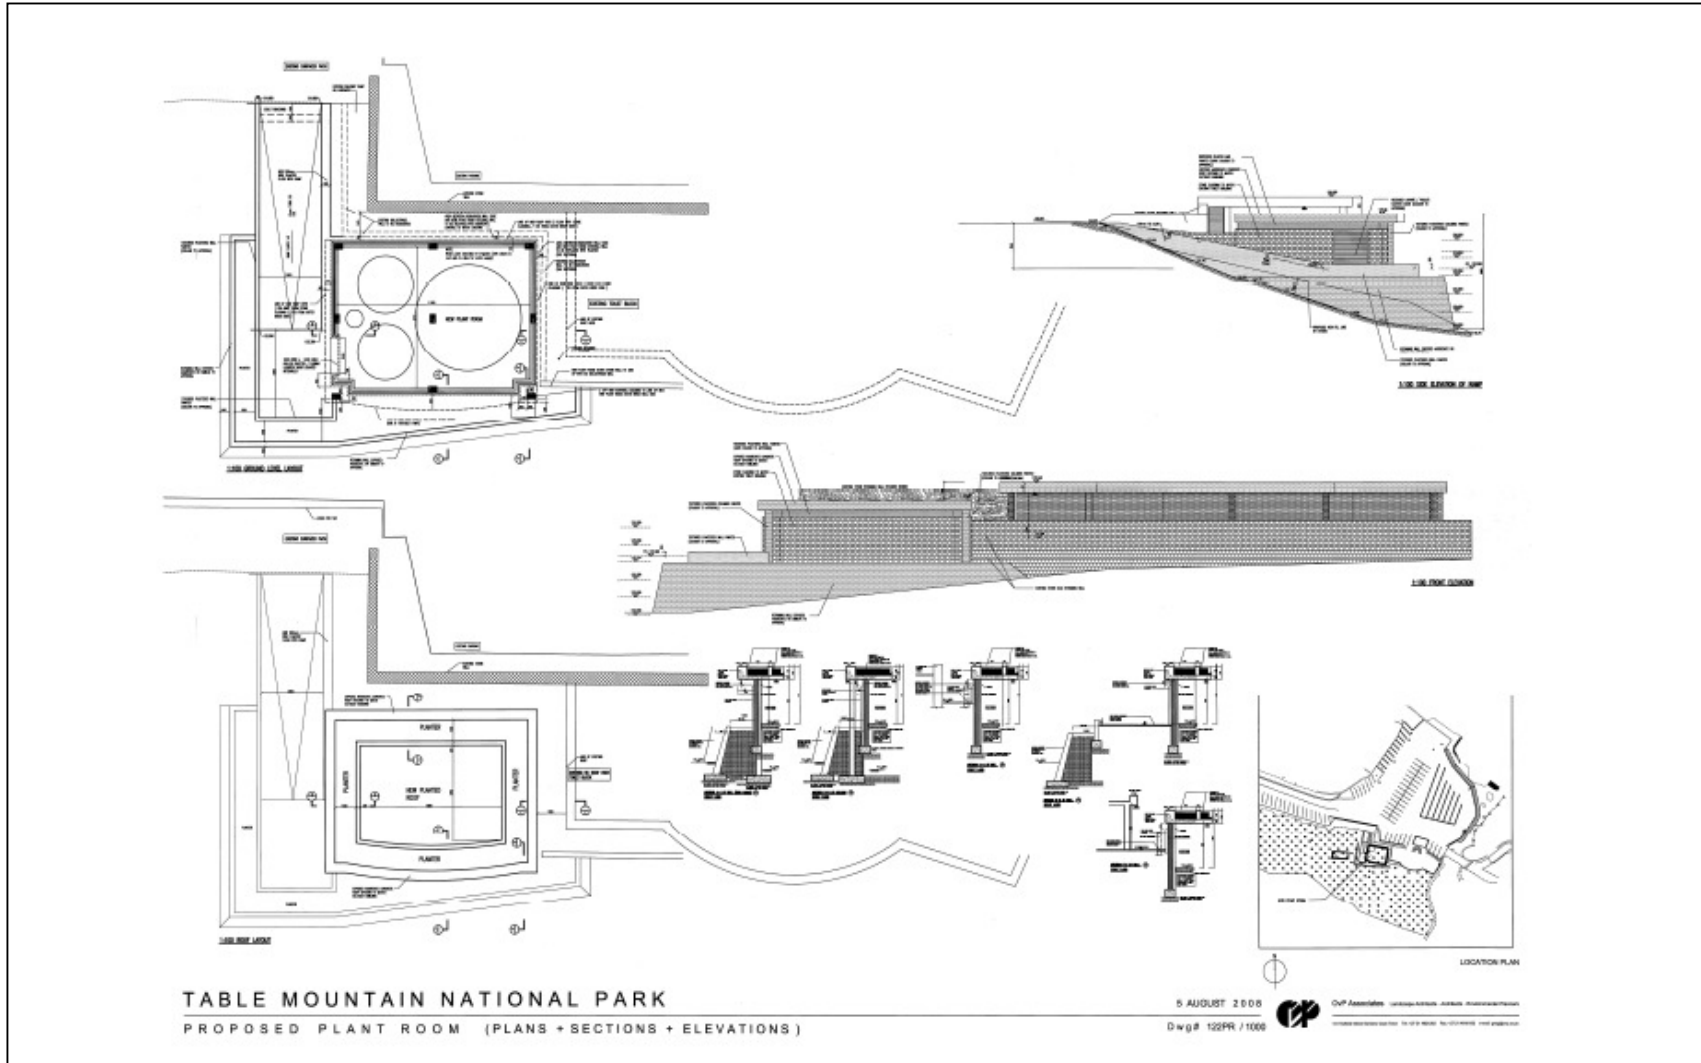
Engineering drawing showing the proposed layout and elevations
